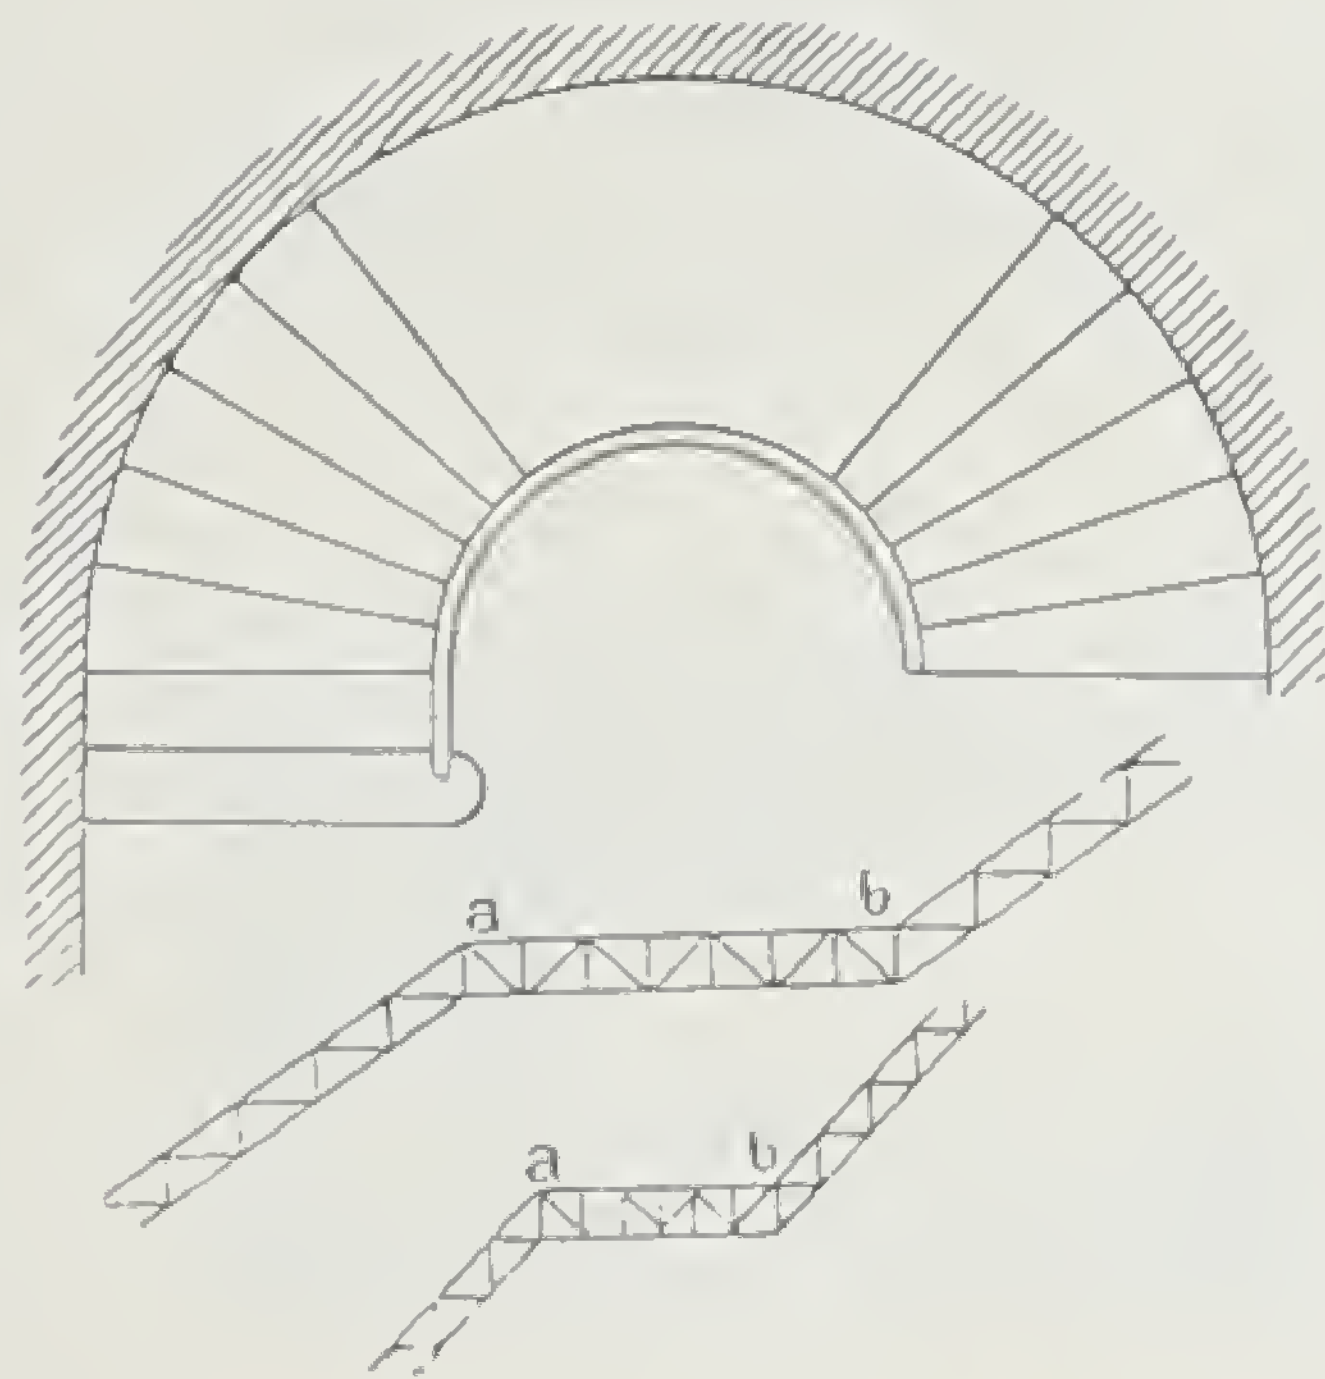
Ground plan of a winding staircase with intermediate landing and landing girder.
